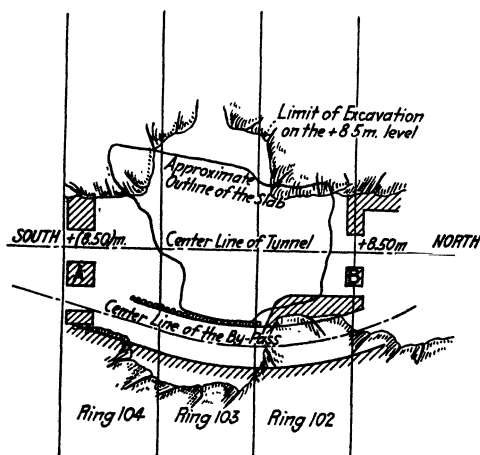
GENERAL PLAN AT RING 103, DURING CONSTRUCTION OF THE REINFORCED CONCRETE SLAB.
